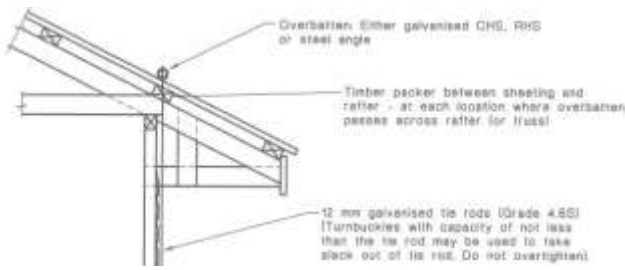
Stud frame external tie rod (i.e. overbatten) detail per SAA HB132.2 “Structural upgrading of older houses – Part 2: Cyclone areas”
